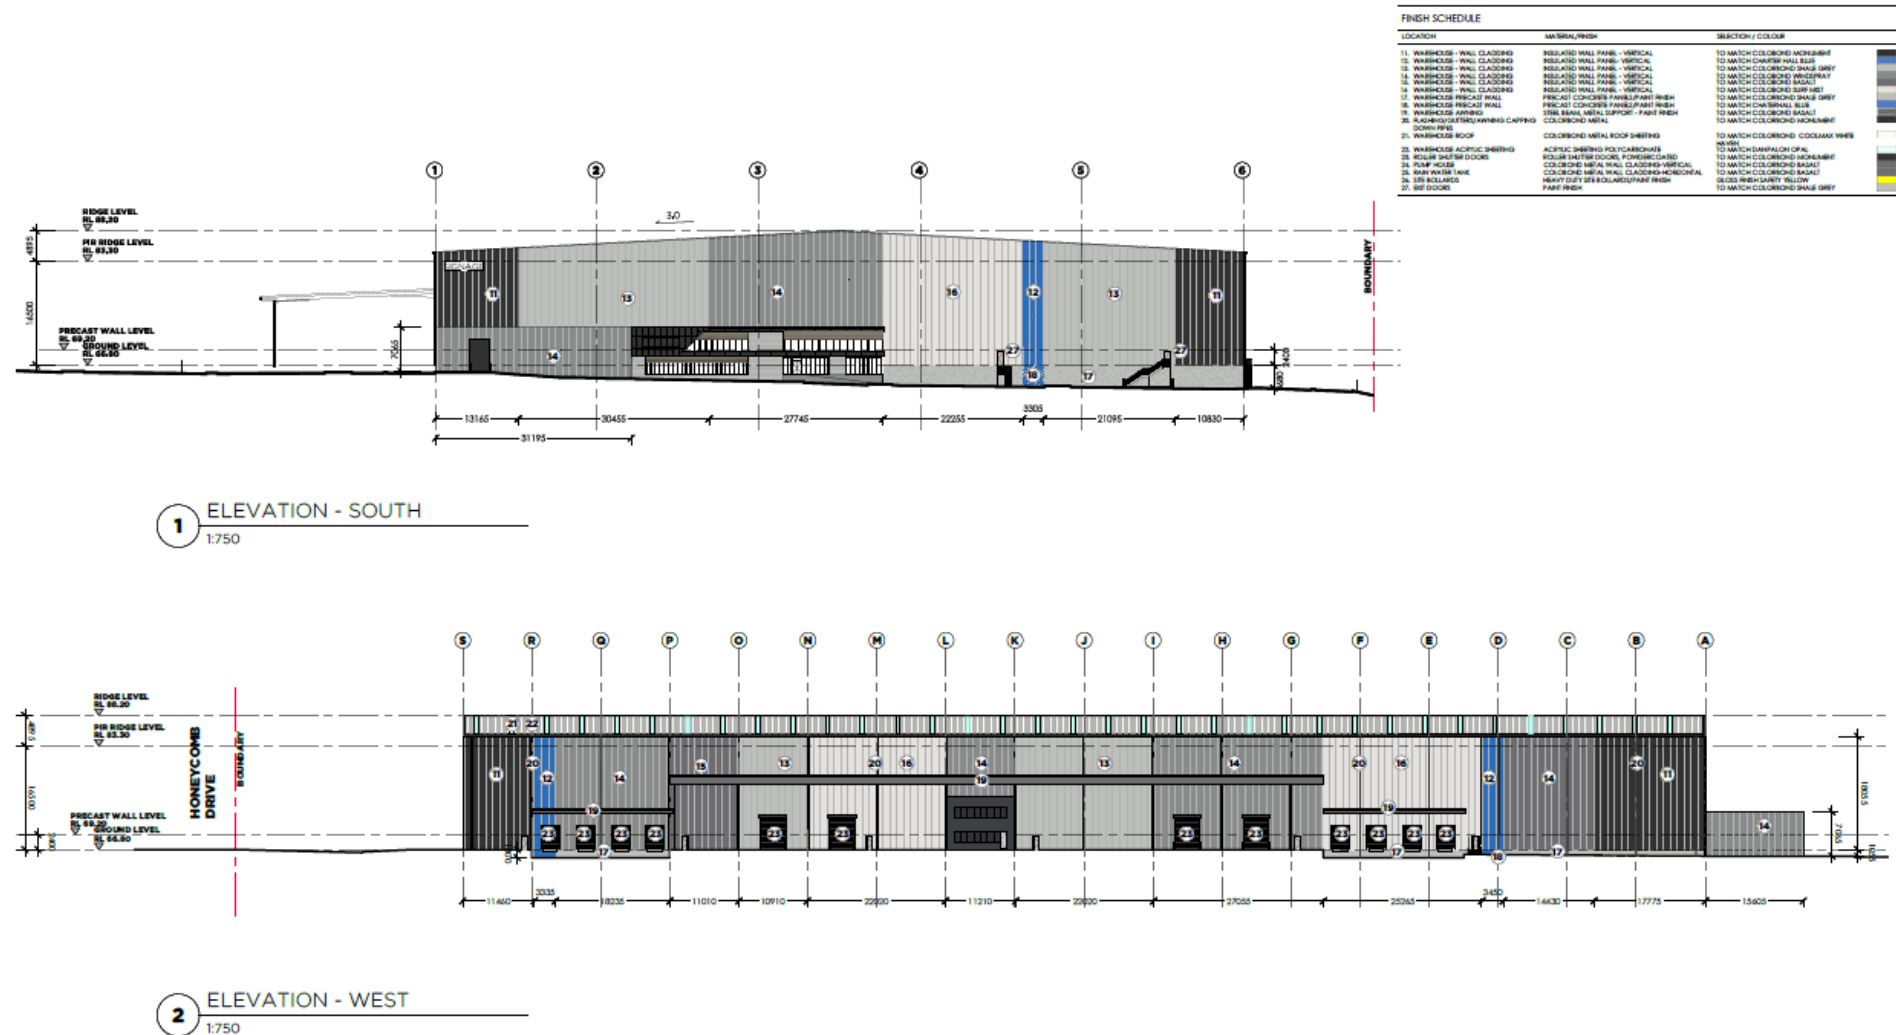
Indicative Elevations (Source: Watch This Space Design, 2021)
